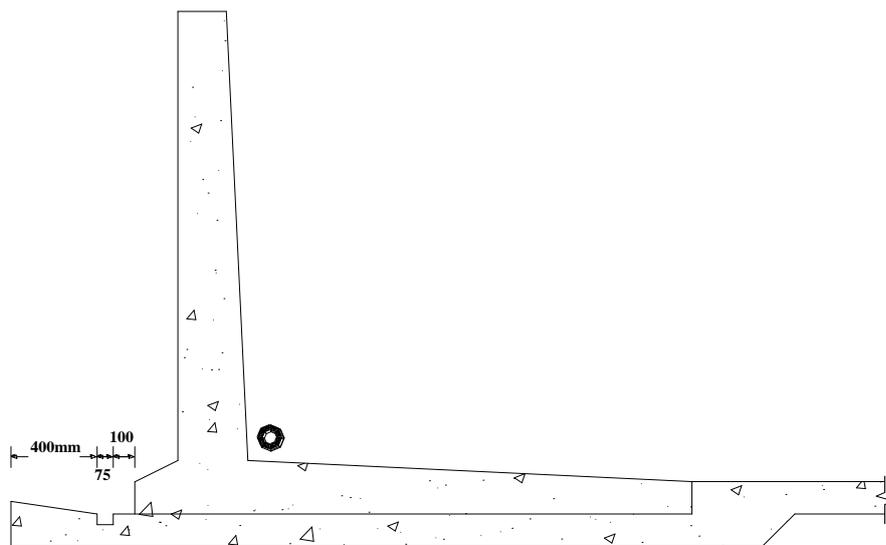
Effluent drainage arrangement for walled silo where precast concrete retainers are used
